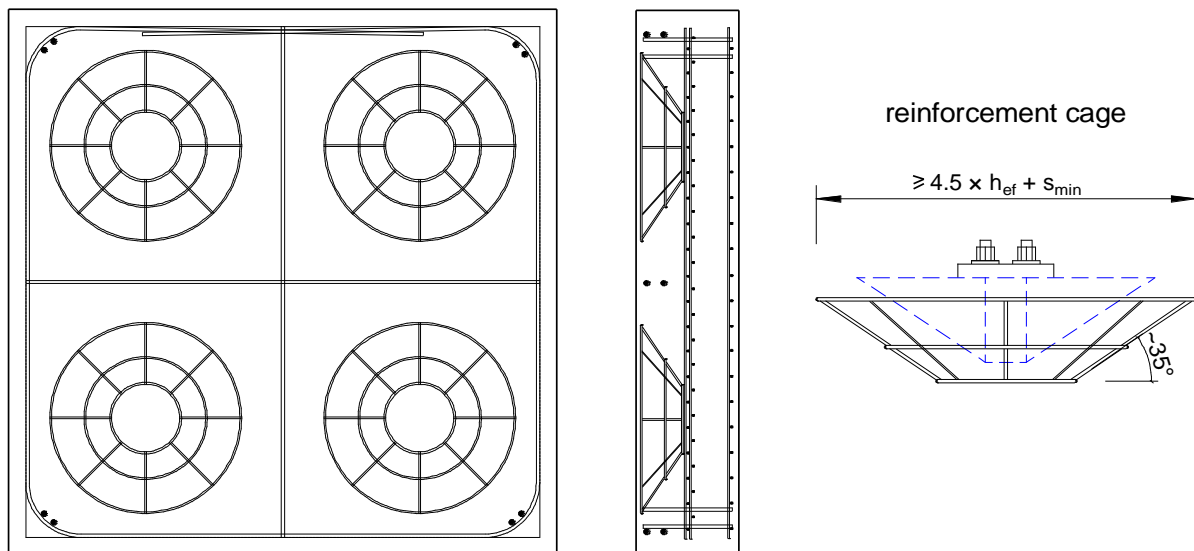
Example of the reinforcement layout for concrete cone failure tests
